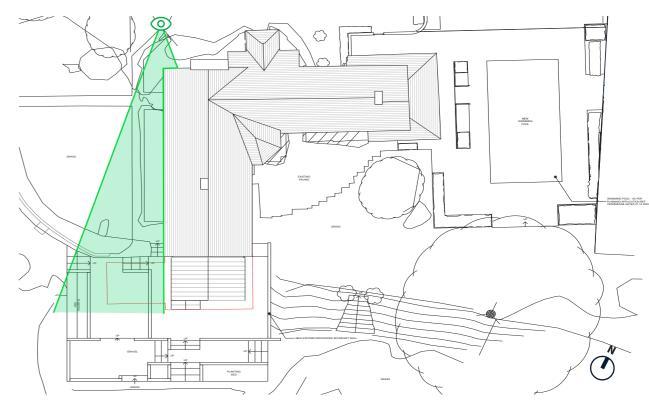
Existing extension oversails westwards beyond the gable. Proposed design sits within the gable and does not extend south beyond the existing extension
